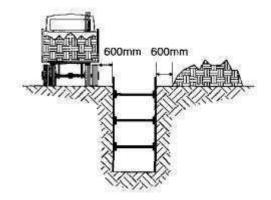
Excavation with Shoring Designed for Surcharge Loads.
